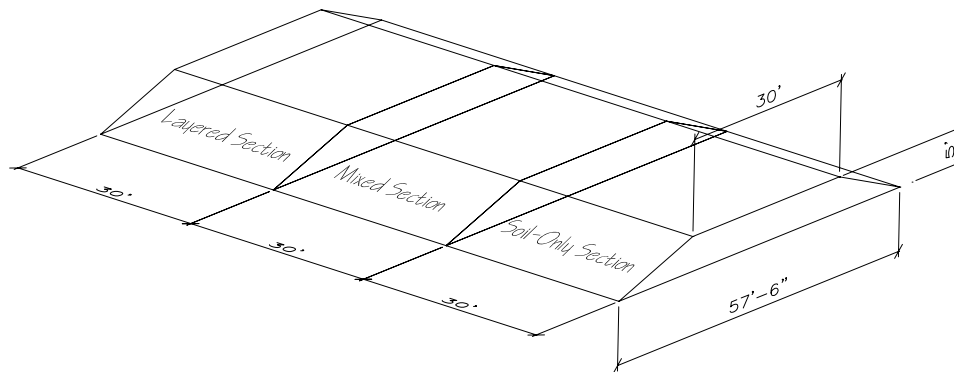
Tire Shred-Soil Embankment Section Dimensions
